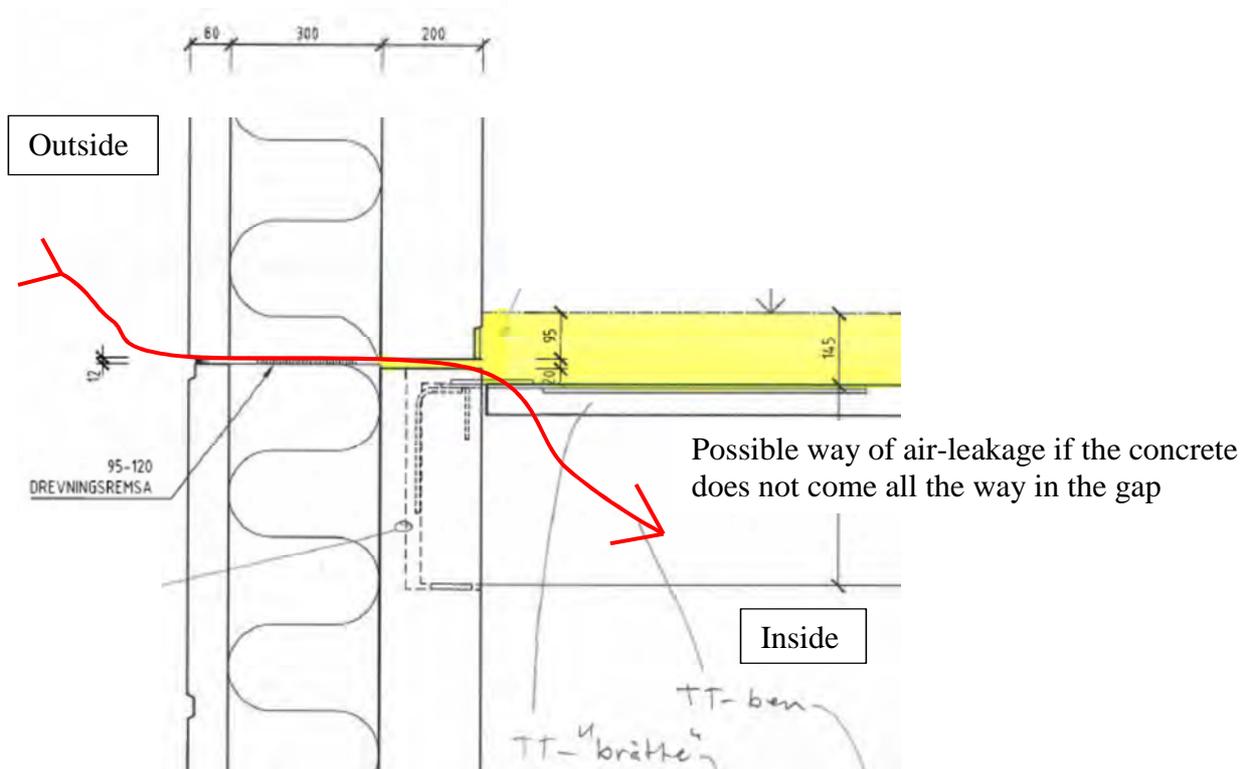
Outer wall construction drawing with possible air leaks in the gap between concrete elements
